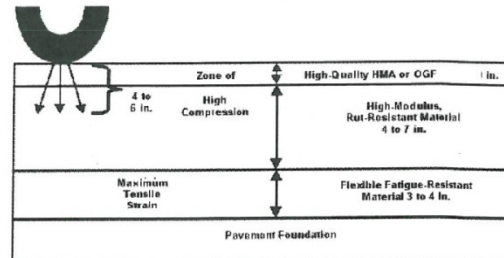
Perpetual Pavement Design – Typical Cross Section.
